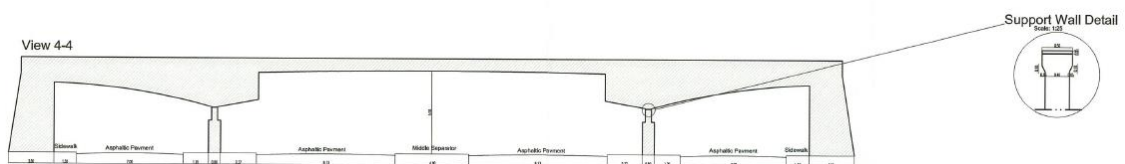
Longitudinal cross section of the bridge (section 4-4)
